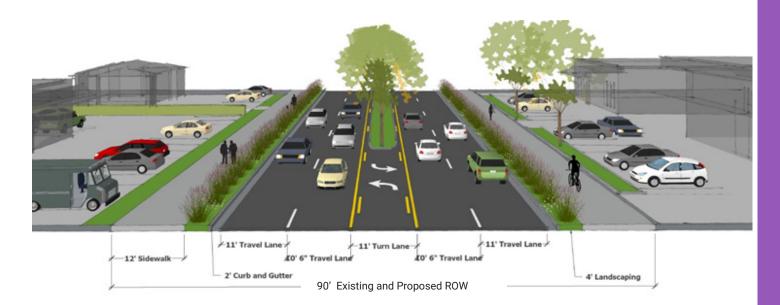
TEMPLE TERRACE MAIN STREET AREA SKETCH
